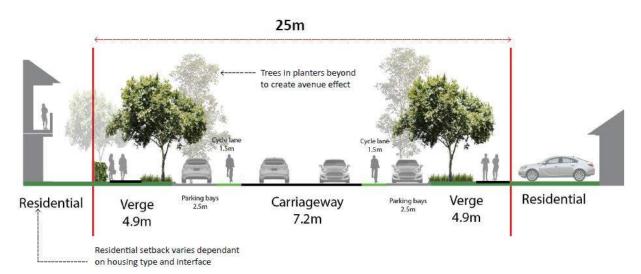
Cross Section - Neighbourhood Centre Road
